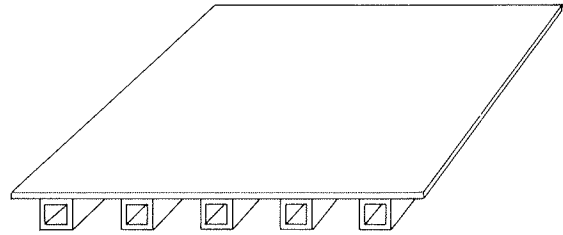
Typical prestressed-concrete spread box-beam bridge.
